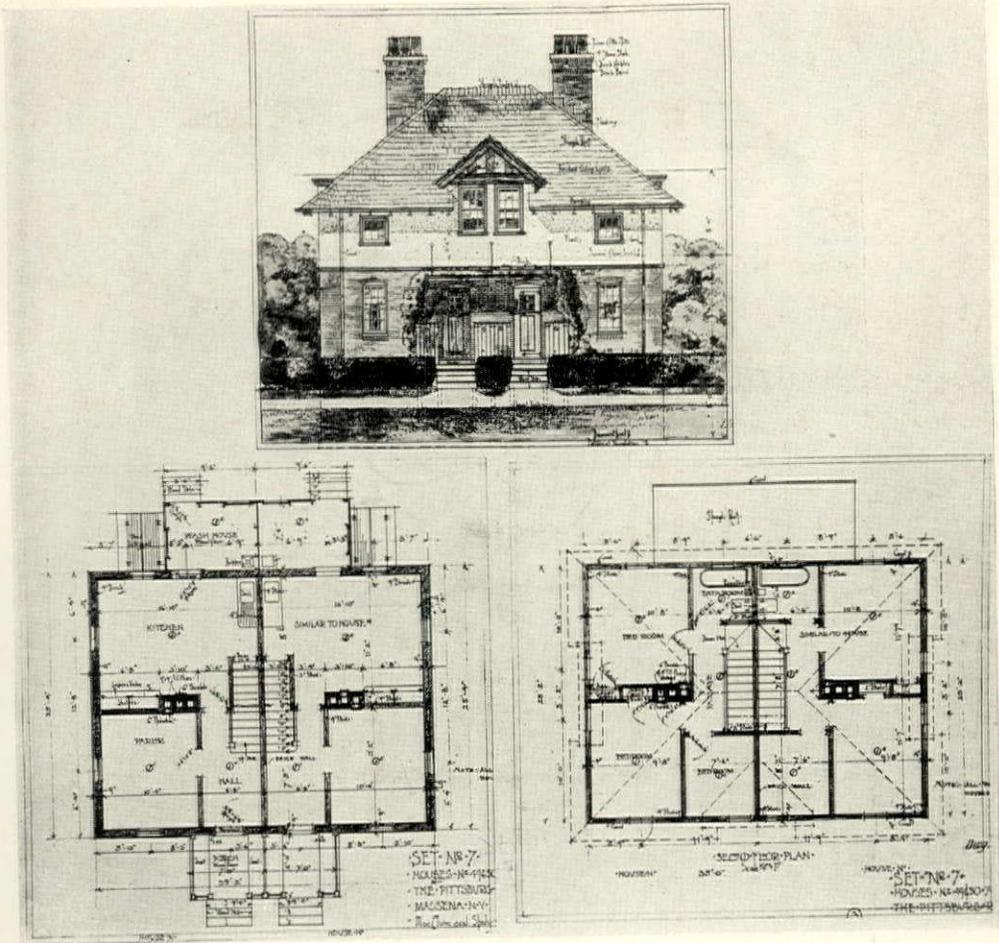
ELEVATION AND PLANS OF TWO-FAMILY HOUSE—ALUMINUM CO. OF AMERICA, MASSENA, N. Y. Albert H. Spahr, Architect.
